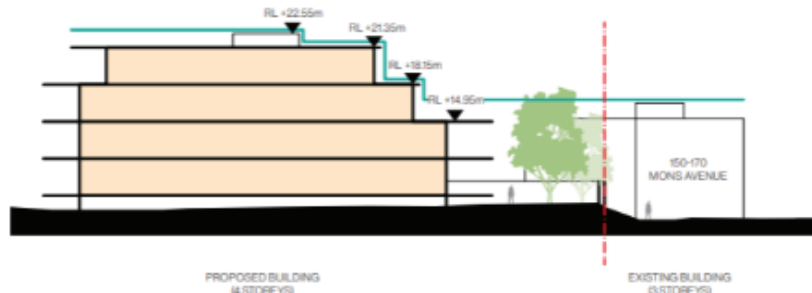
Section Building B and 150-170 Mons Avenue (Source: Group GSA Design)
